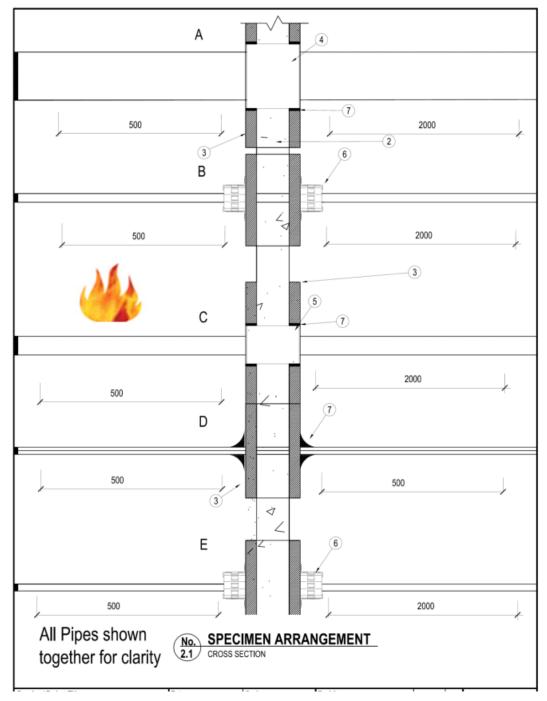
Plan view and cross sections of test specimen and cut hole locations as shown in FSRG A-12-775a – dimensions in mm
